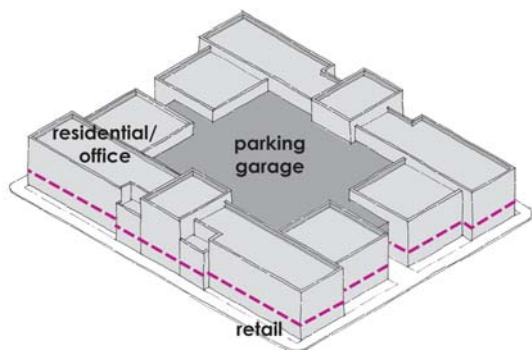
a-b Parking is contained to the site and is in a structure accessed from the rear of the building.
